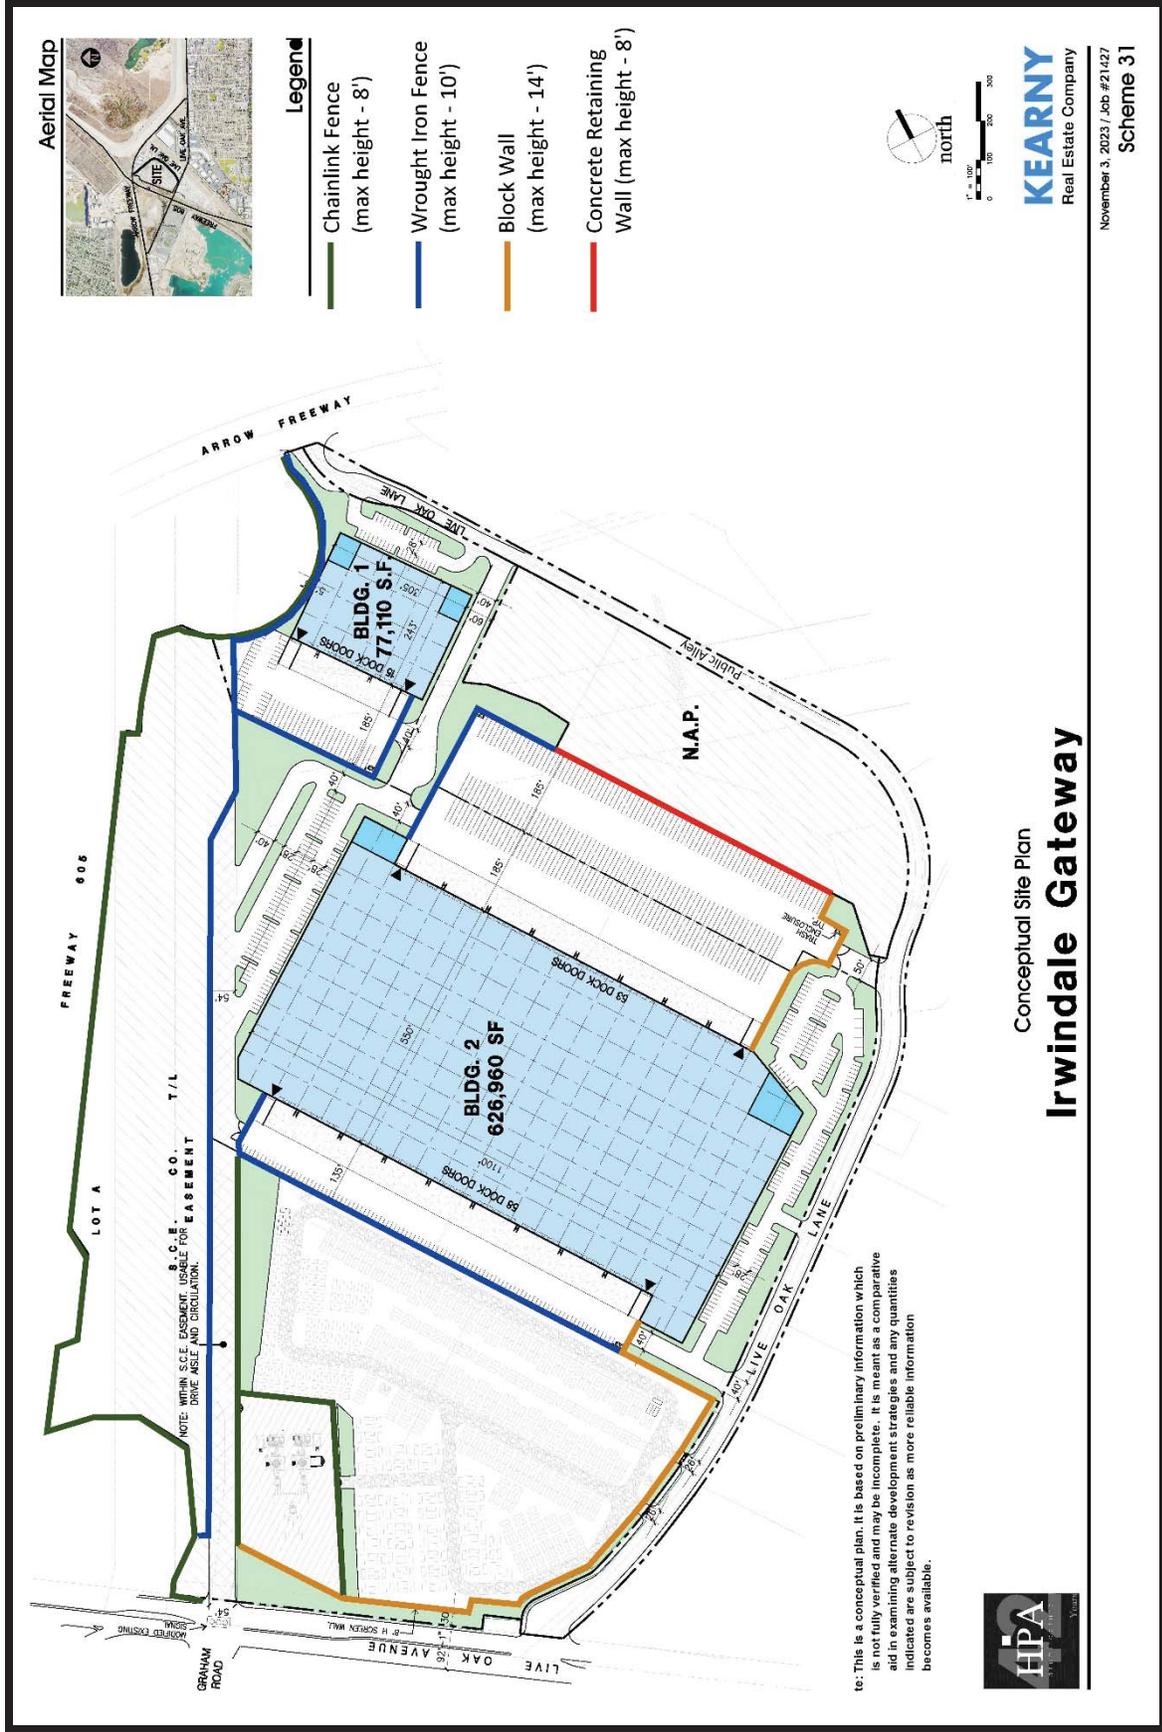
FENCE AND WALL PLAN WITH BESS
